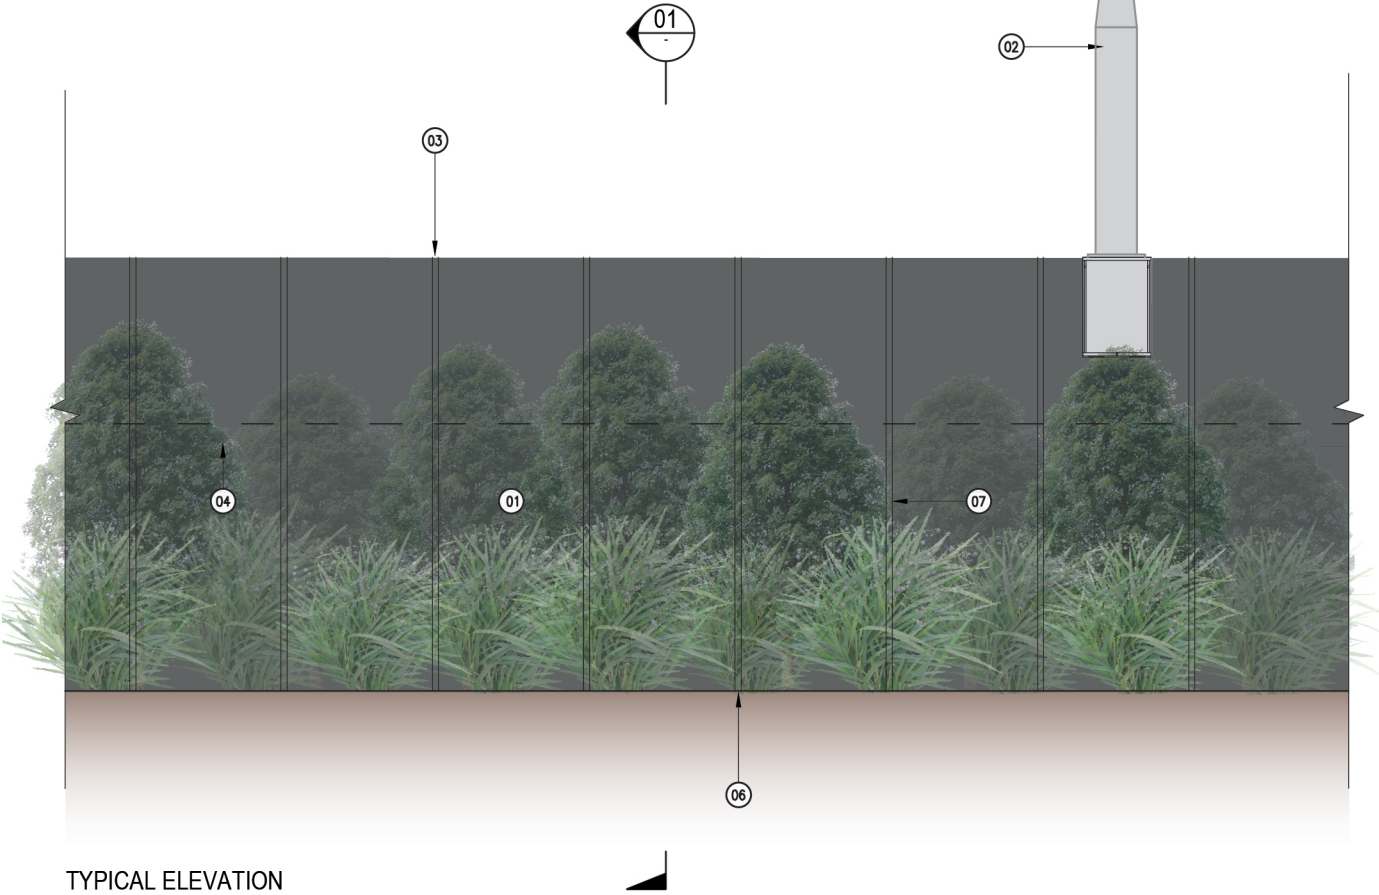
Campbell Street Green Link- Retaining Wall - Type 4A
